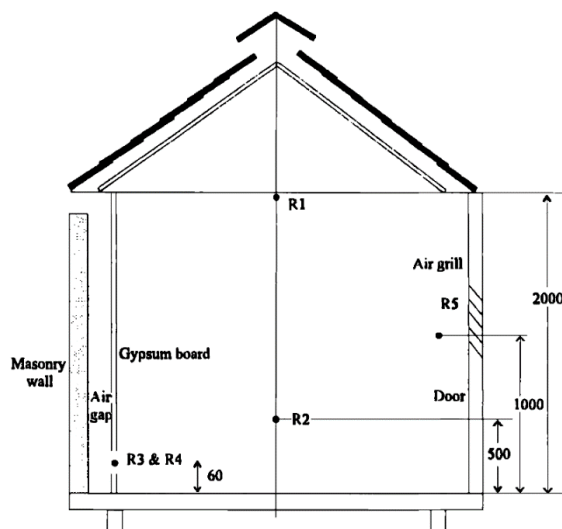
Schematics Modified Trombe Wall attached to a single room house [43]
